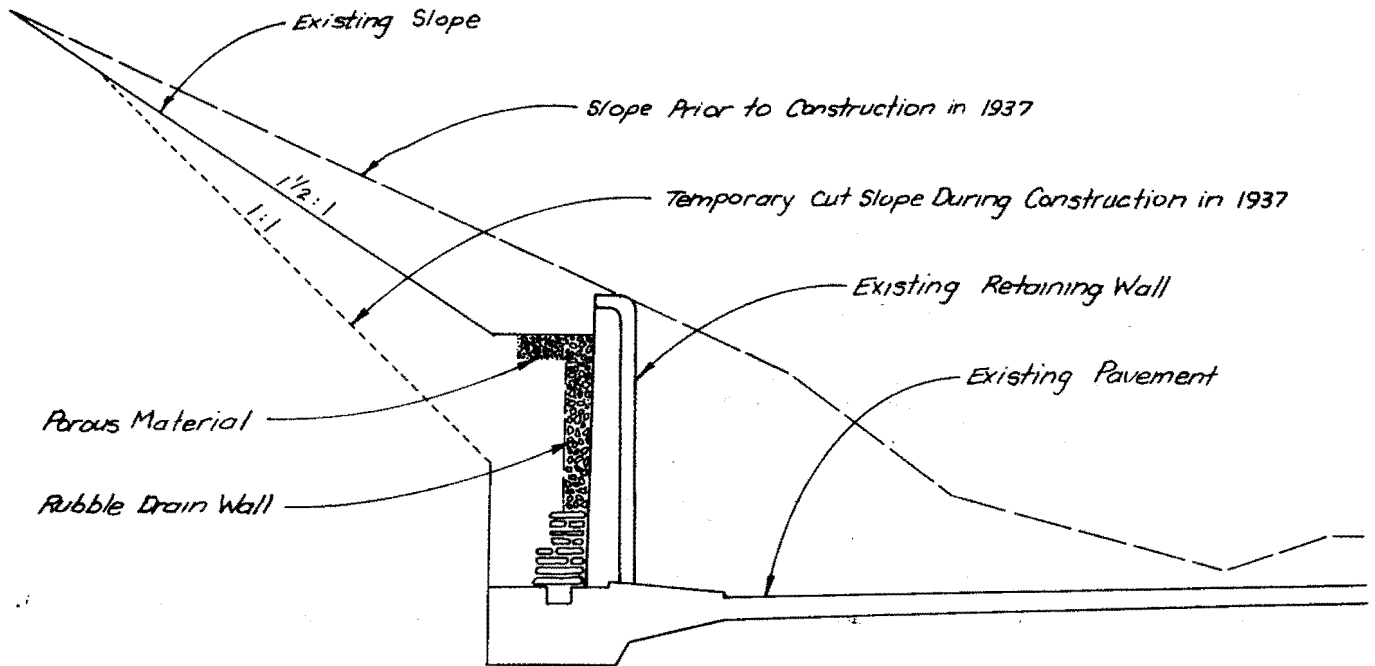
Typical pre- and post-construction (1937) topography along the Columbia Parkway retaining wall.
